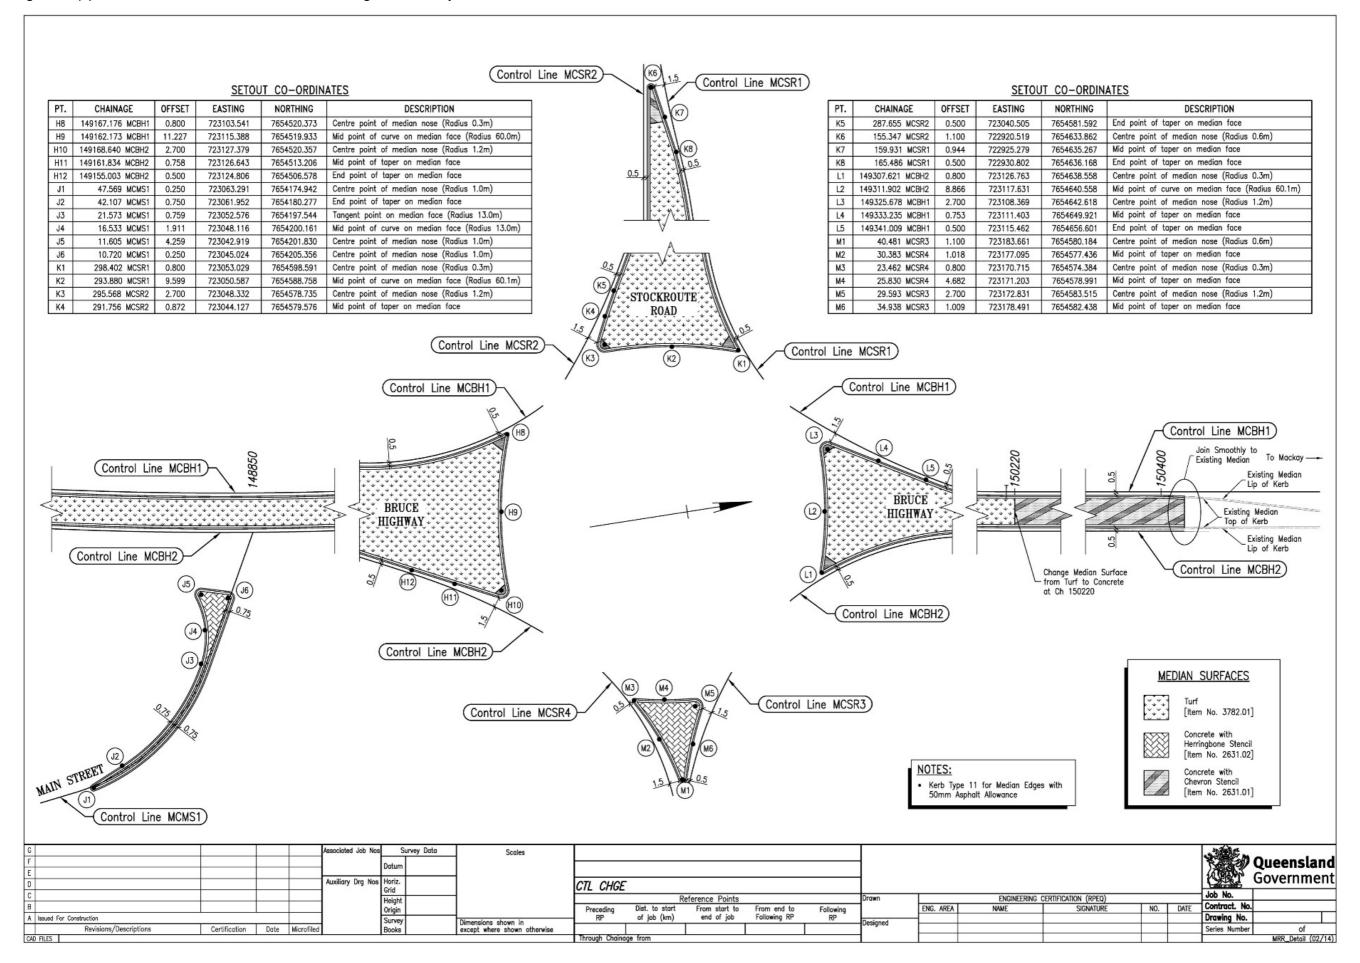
(c) – Intersection details and set-out tables – generic example 3
